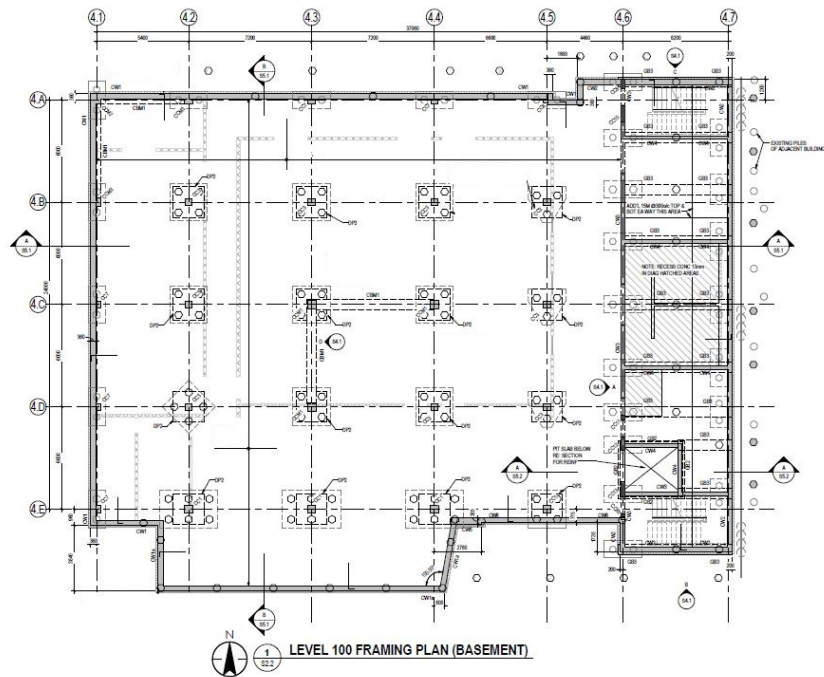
Basement plan view at elevation -4.250 m (courtesy of Stantec and the University of Manitoba).
